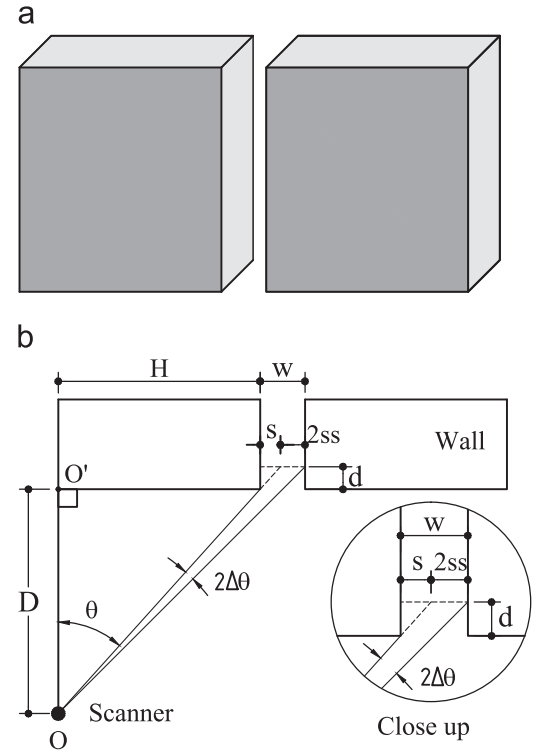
Schematic diagram of a fully open crack and its relation to a laser scanner's beam. (a) Elevation and (b) A cross-section.
